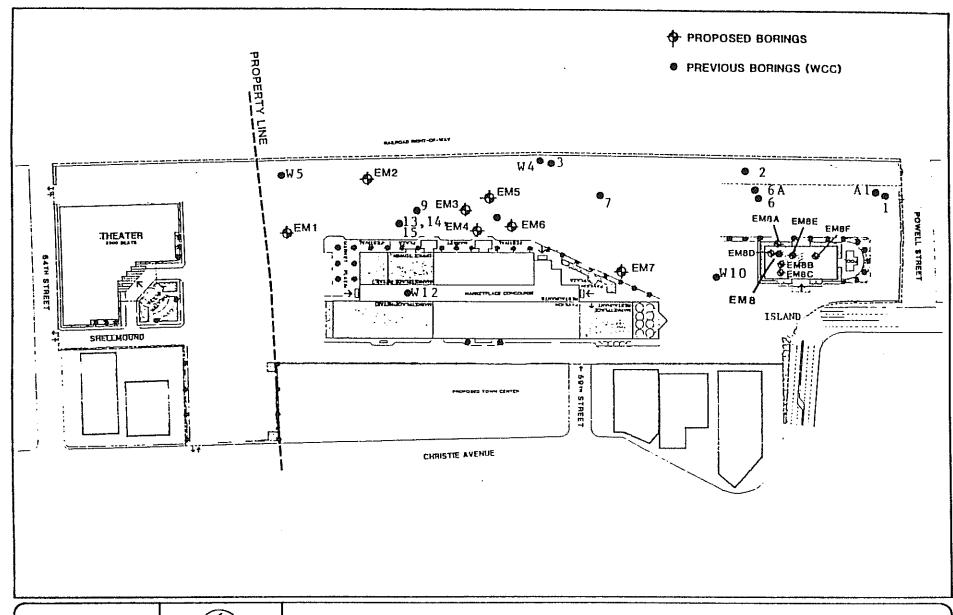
MARKETPLACE PROJECT SITE DETAILING BORING LOCATIONS
